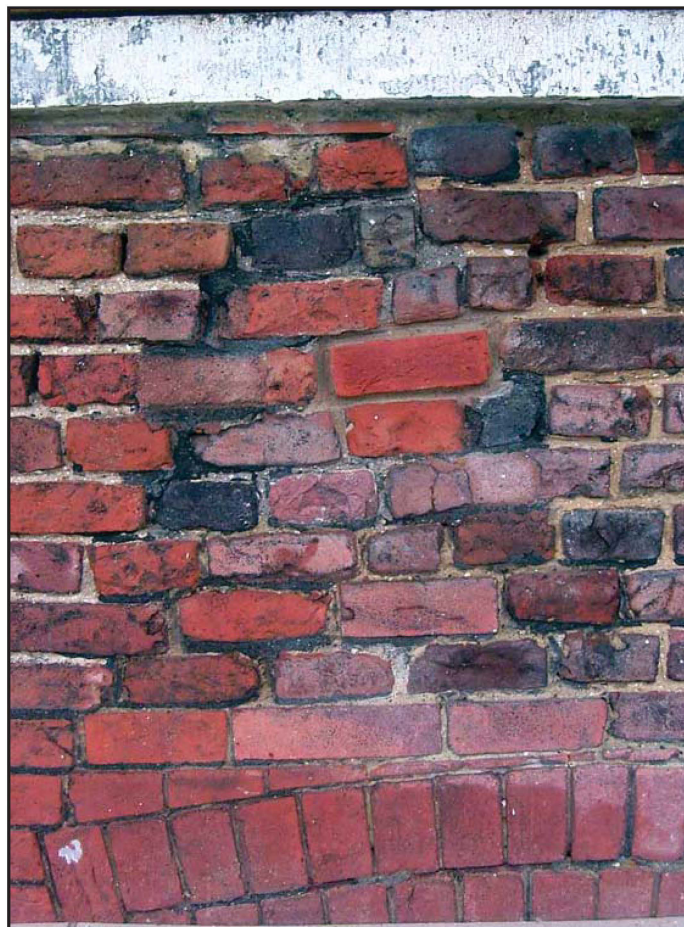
West elevation, external view, between first and second floors, showing mixed phased patching at break between Tudor and 17th century brickwork
